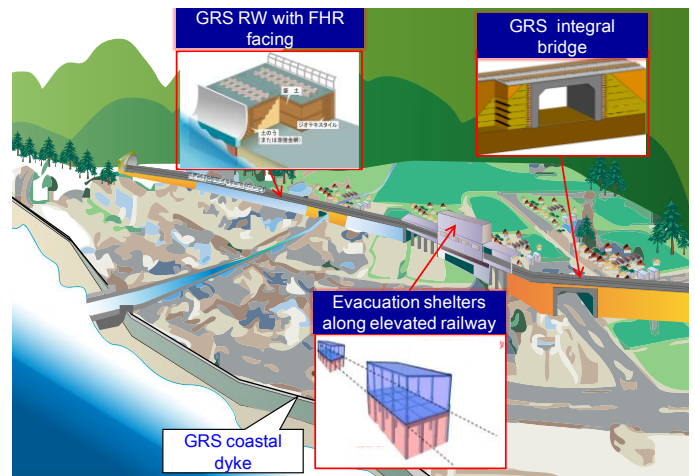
Coastal railway that can survive a great tsunami (Railway Technical Research Institute, Japan, 2011).
